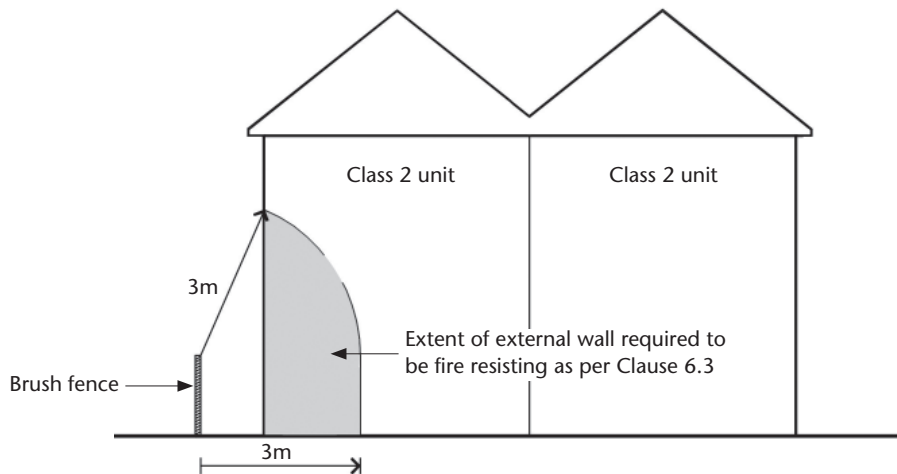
(d) Exposure of a two storey Class 2 building to a brush fence
